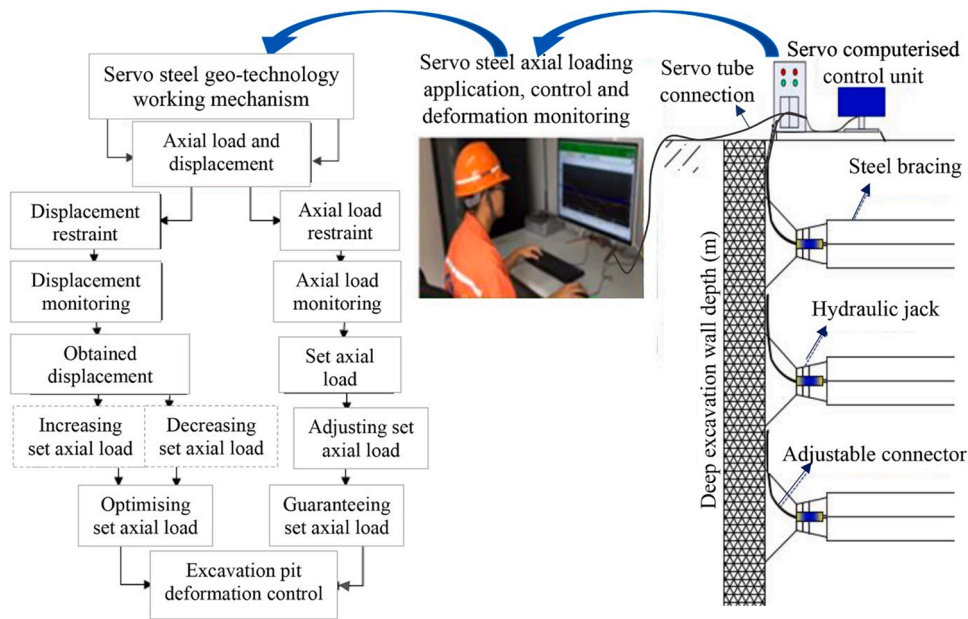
Field construction site application arrangement showing the working principle of steel material servo enhancement system.
